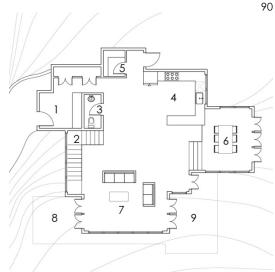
First Floor Plan - 1. Entry 2. Stairs 3. Powder Room 4. Kitchen 5. Pantry 6. Dining 7. Living 8. Deck 9. Outdoor Dining
